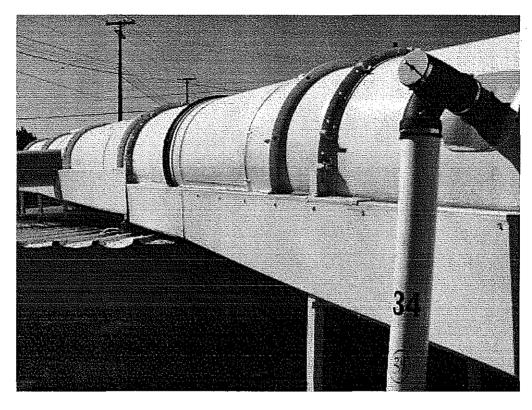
(Photo 4) : Scrubber #3 ductwork, looking southeast.
